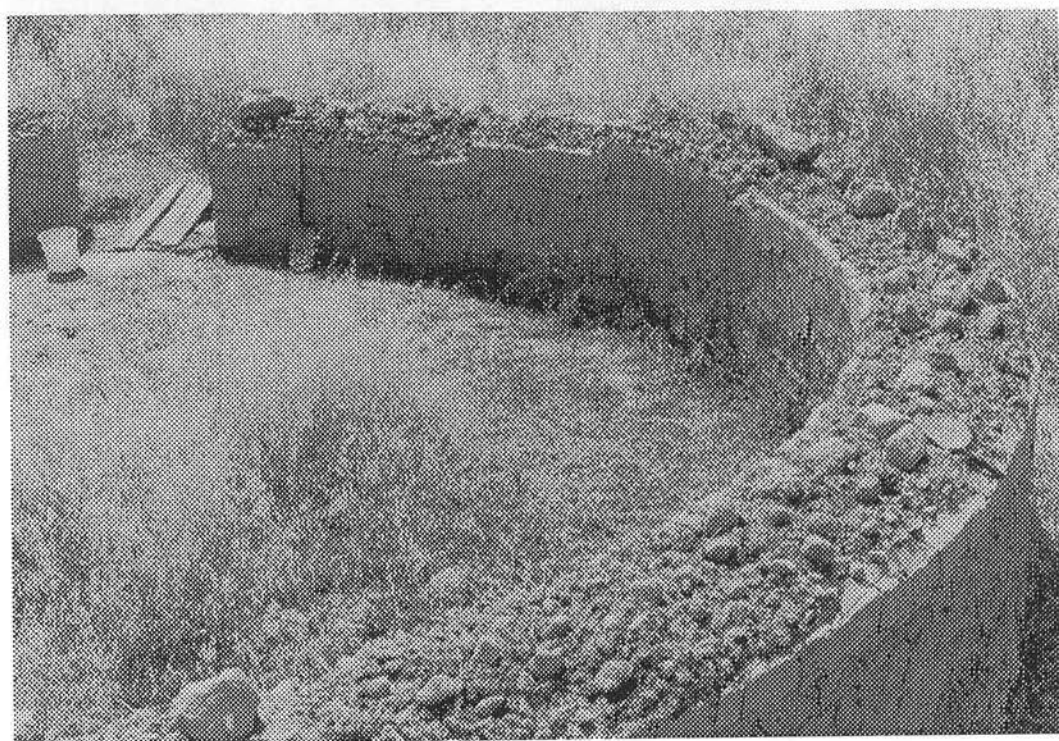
LEV, RH1 mudwall construction showing block fractures and internal materials.
